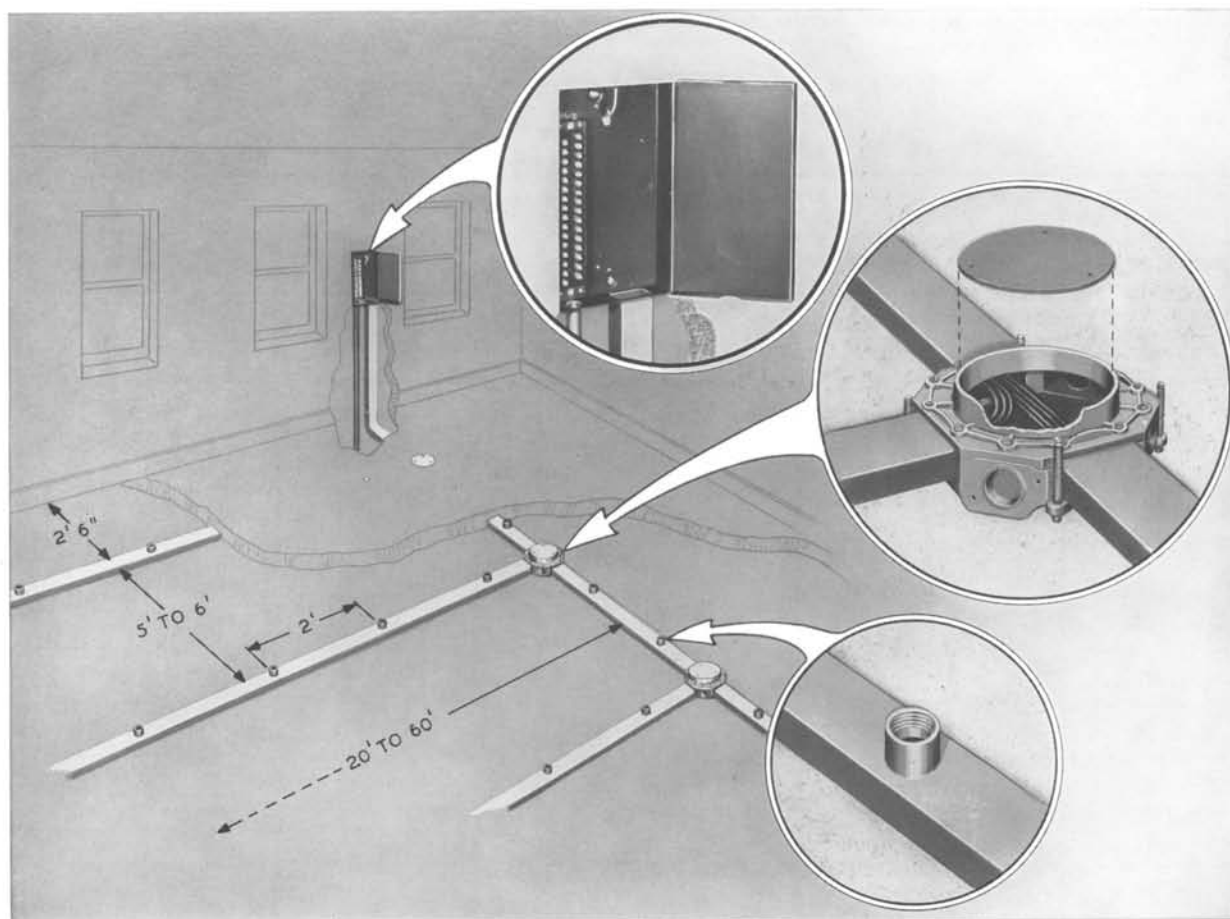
STEEL GRIDWORK CONDUIT SYSTEM
